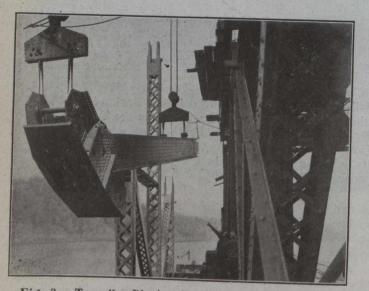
Traveller Placing End Batter Post and XL0 Joint of Suspended Span
